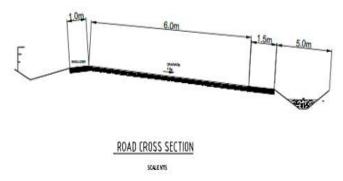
Screen shot of relevant engineering plan showing the cross-section for Carrabungup Road in the vicinity of Munginup Swamp. See Appendix F2 for full plan (Shire of Murray 2021)
